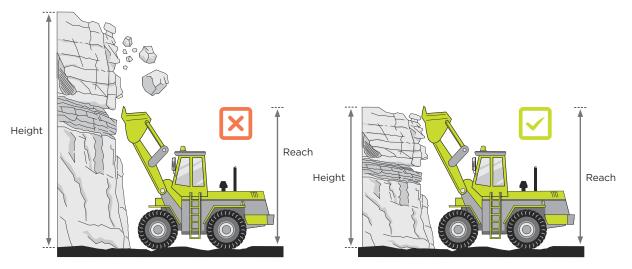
Face height should not exceed the reach of the loader used on the face
